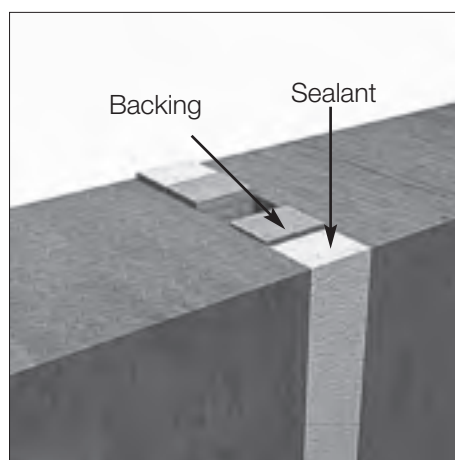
Typical installation of linear joint sealing system (shown with backing in this example).
